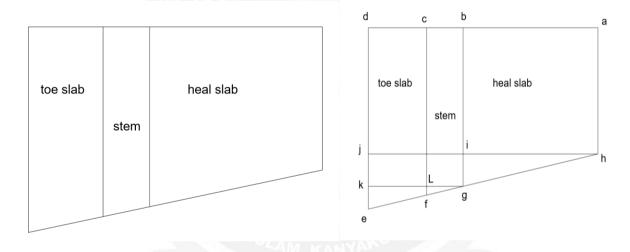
Cantilever retaining wall (Stability calculation Top view)
